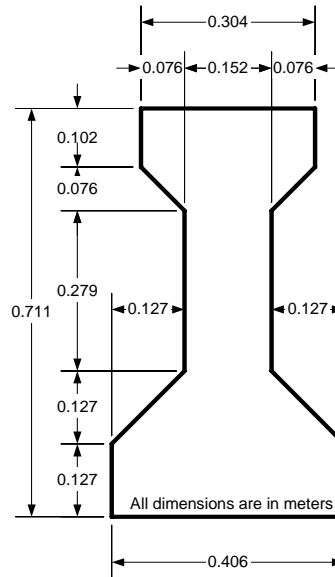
Dimensioned Cross-Sectional View of Saco Bridge Girders
